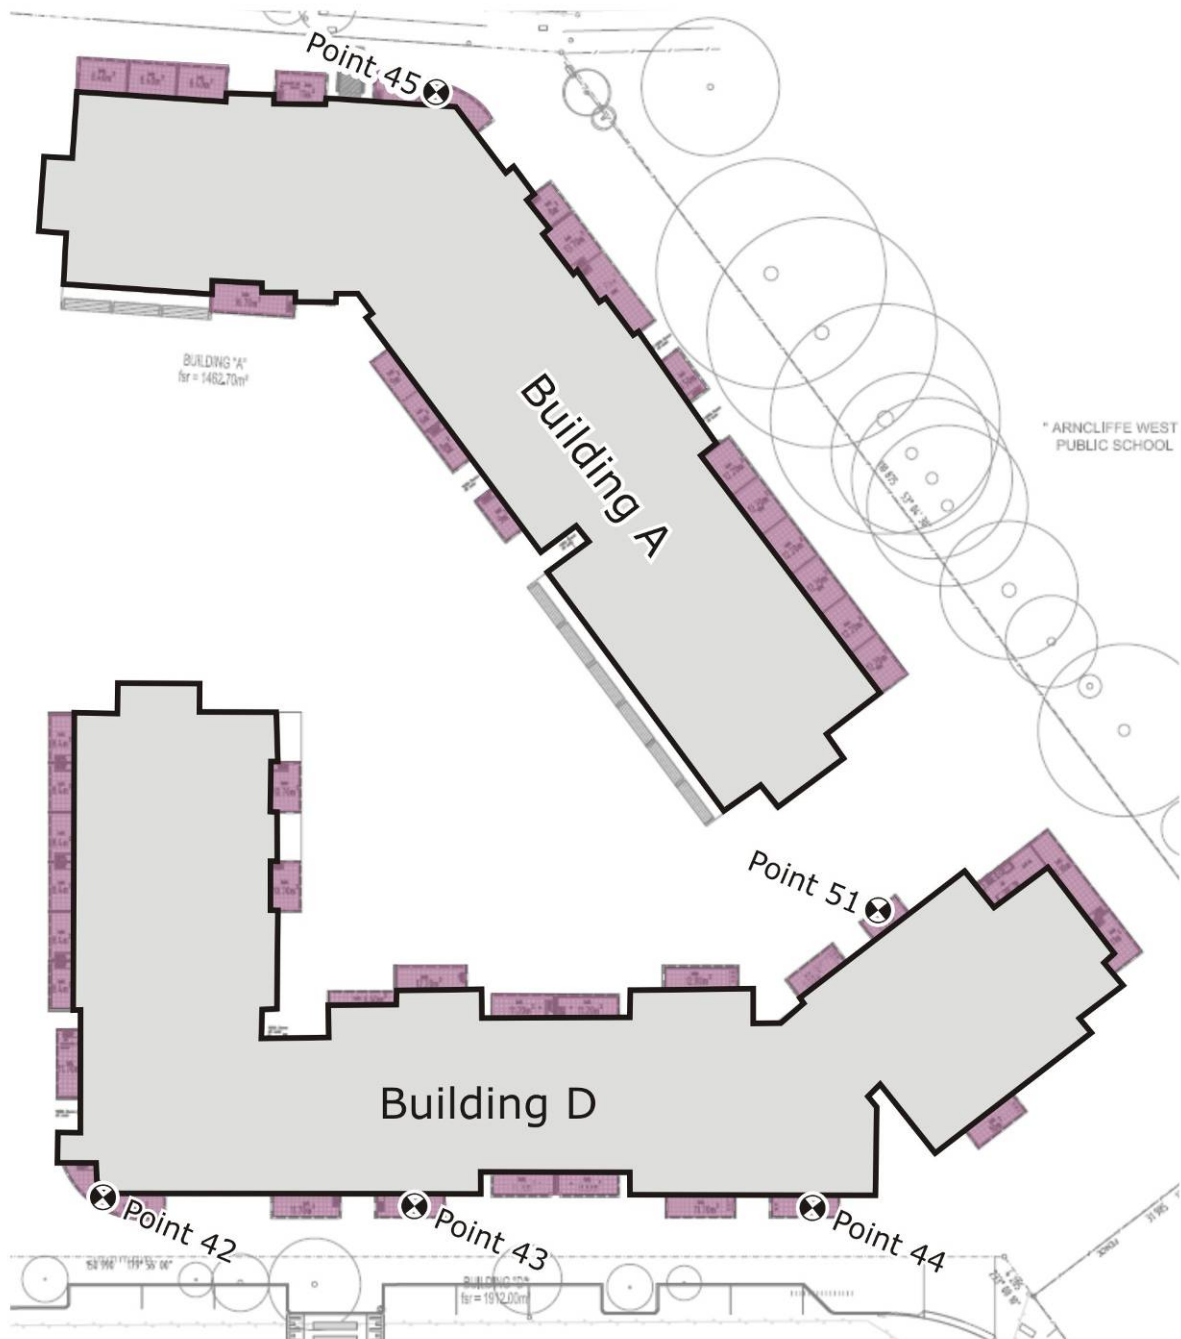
Study Point Locations – Balcony Levels on Building A and Building D (recommended wind comfort criteria also shown)
